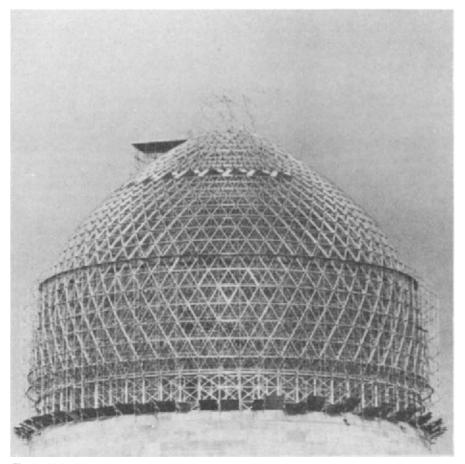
Aluminium roof of 50 m diameter structure for the Selangore State Mosque, Malaysia. Tubular construction, employing special extruded node units for the joints. Tubes in 6061-T6 alloy, and all other extrusions in 6082-T6. (Triodetic system. *Courtesy:* British Alcan Aluminium plc)
